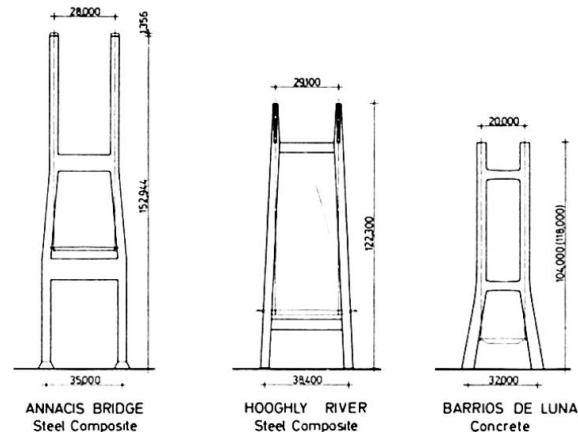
Tower shapes for recent long-span cable-stayed bridges
